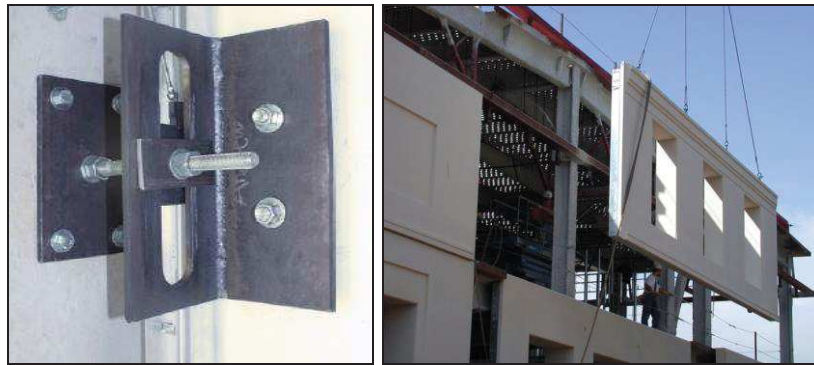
Precast concrete cladding system: example of connection detail and installation of the façade (source: www.designingbuildings.co.uk).
